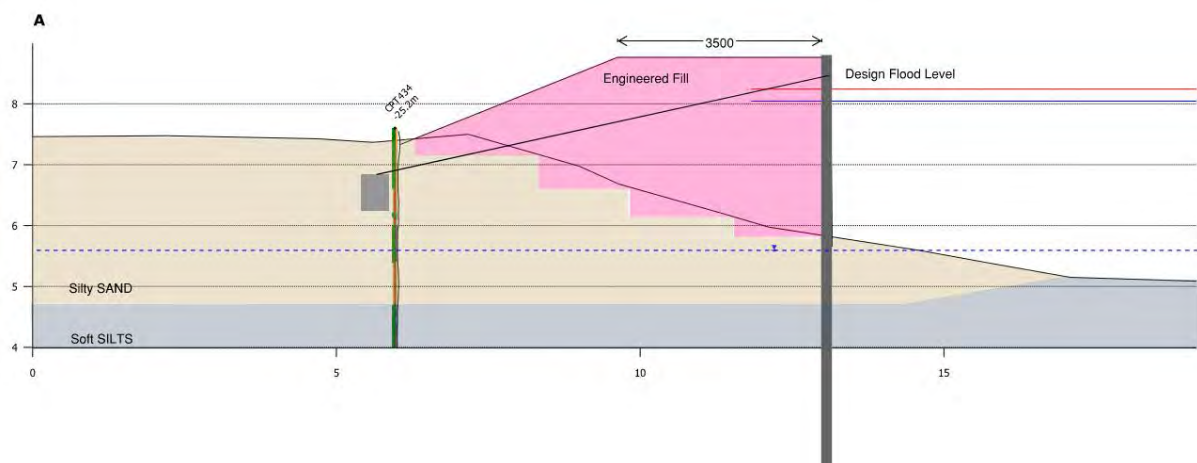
A typical cross section of the kingpost with an anchored solution of the proposed retaining option.
